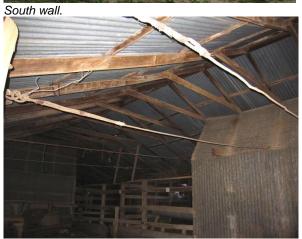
Homestead Group Stables elevations. Jean Rice Architect, site assessment 2009.
